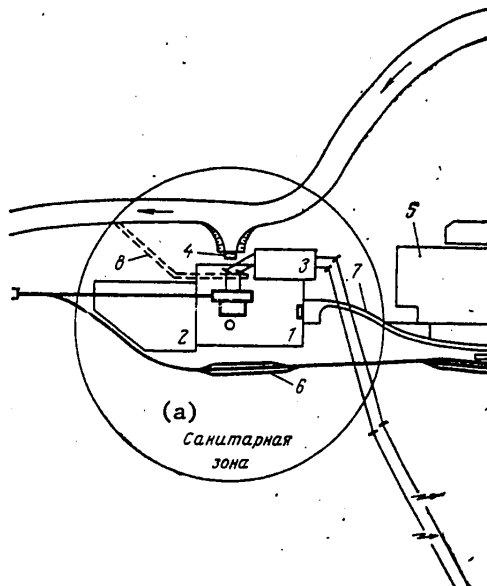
Example site plan of a nuclear power plant. 1 -- industrial site; 2 -- construction base; 3 -- open switch gear; 4 -- service water supply pumping station; 5 -- housing; 6 -- railroad station; 7 -- access road; 8 -- drainage canal.
